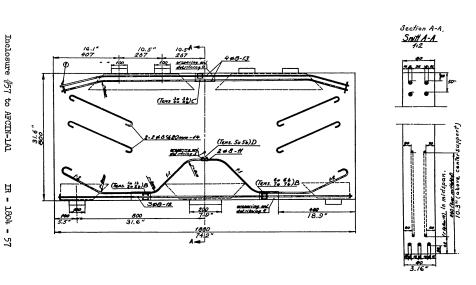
a - Dimensions, Reinforcement, and Points of Measurement of Test Beams of Series I
